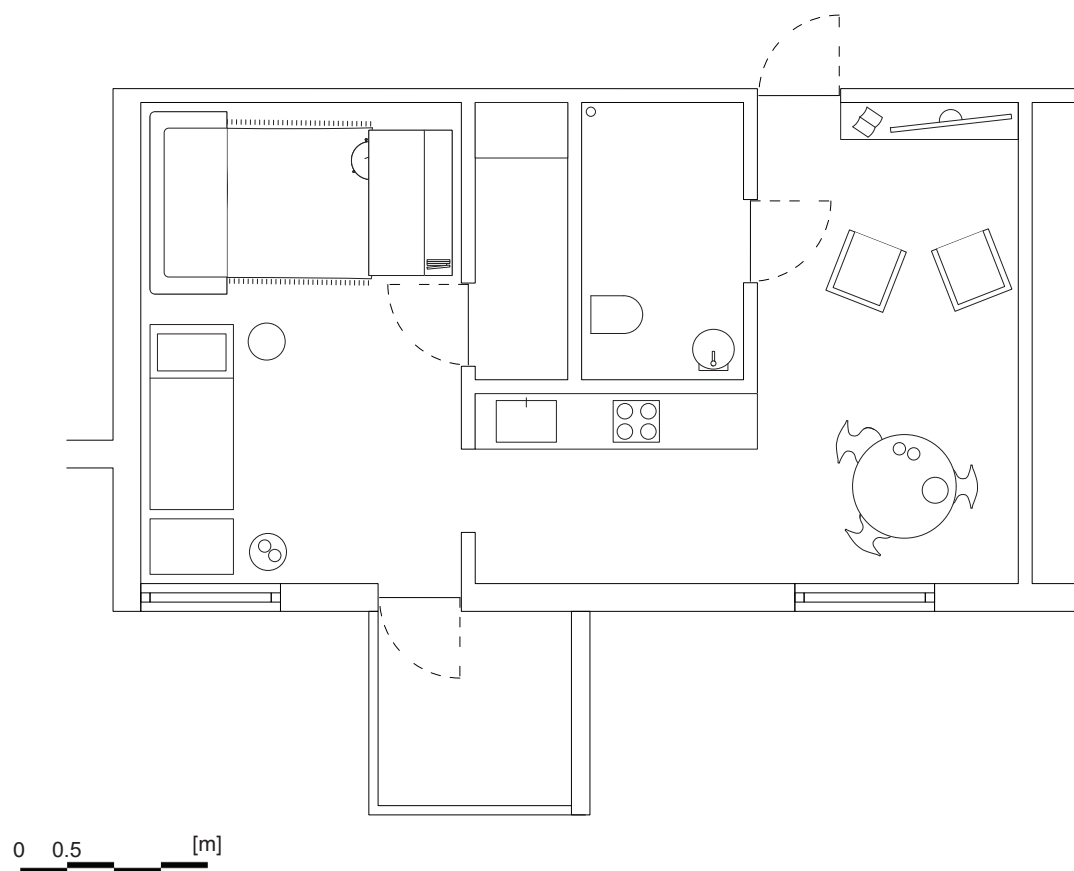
Standard 2-Room Apartment Floor Plan © Davide Landi
